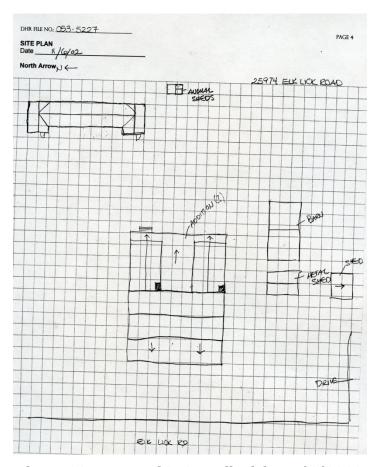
Layout of 25974 Elk Lick, 11/6/2002
